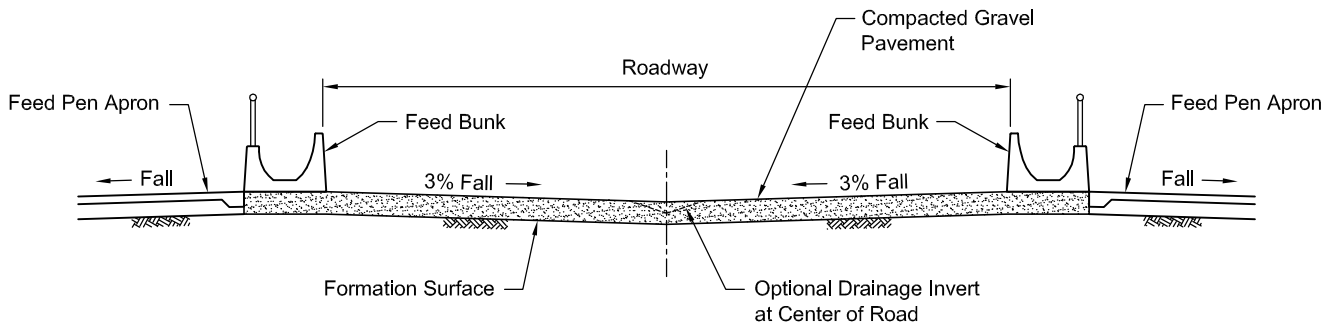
Typical unsealed feed road cross section with back to back pen layout and fall to centre
